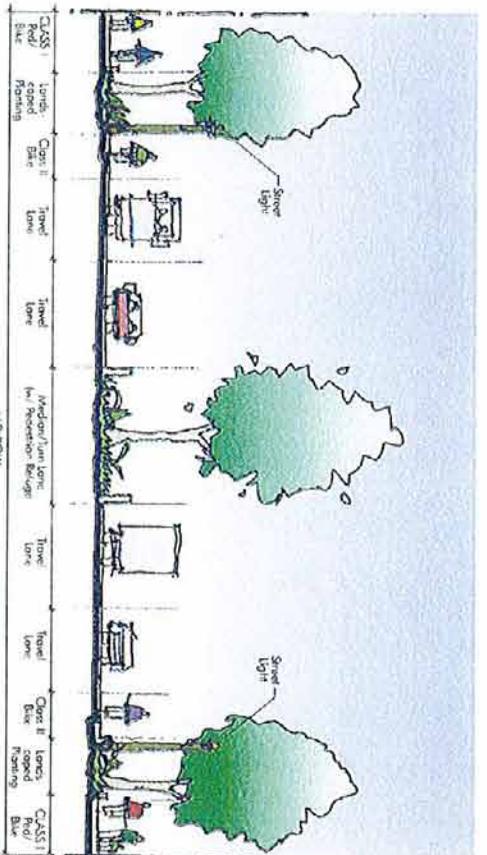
CROSS SECTION OF COMPLETE STREETS CONCEPT B (EAST MAIN STREET TO I-505 INTERCHANGE)
